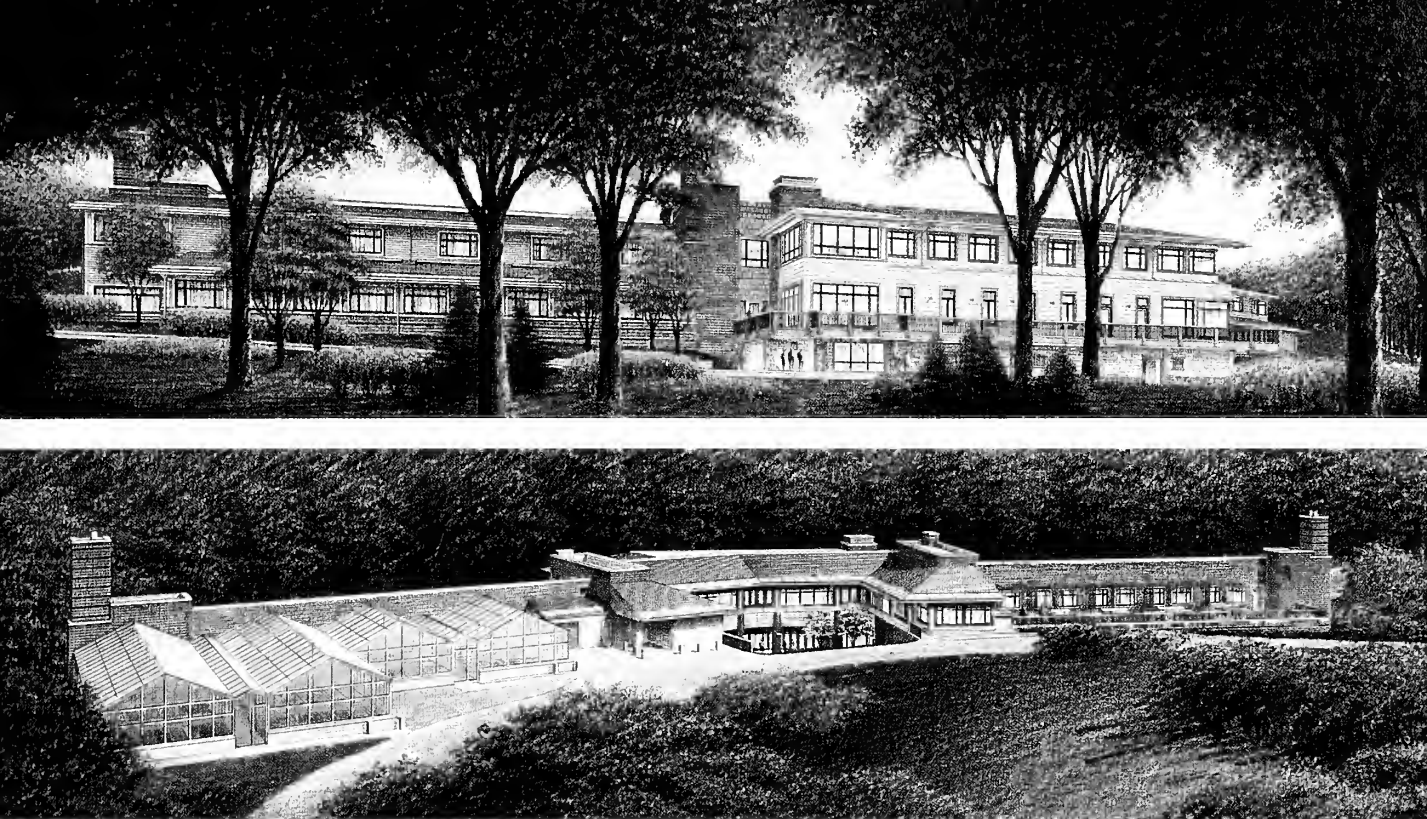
Architectural rendering of the north (top) and south views of the Weld Hill facility, by KlingStubbins.
